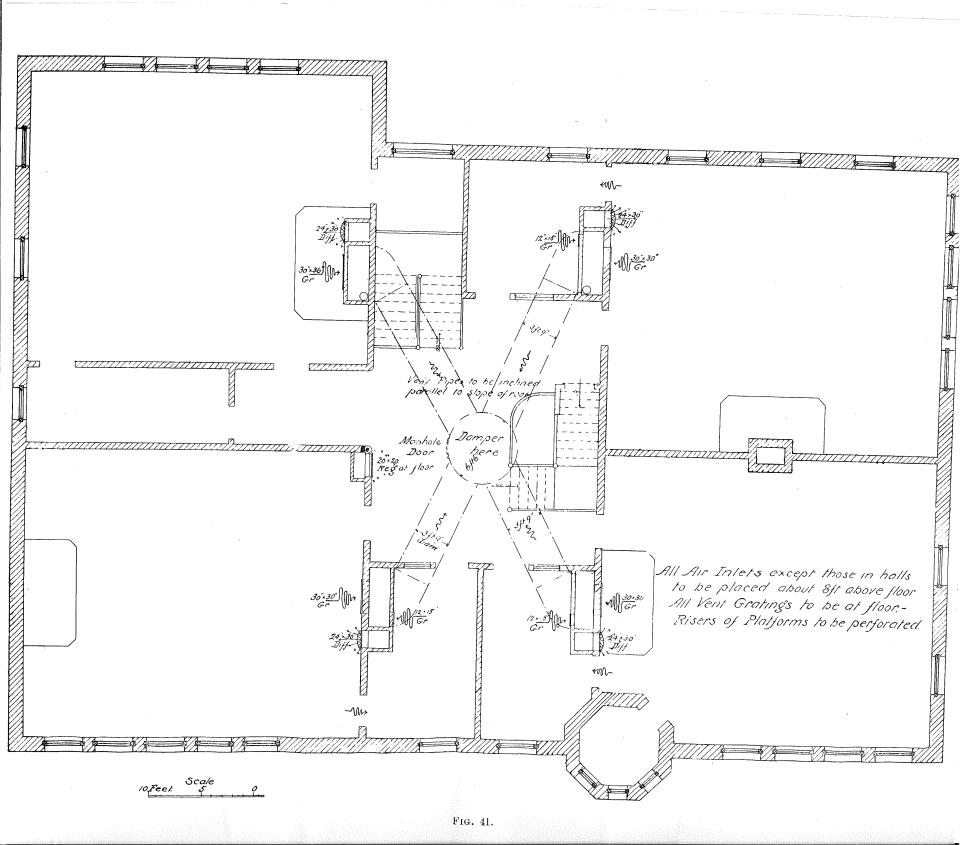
On this plan is shown an arrangement of vent duct piping in the attic.
